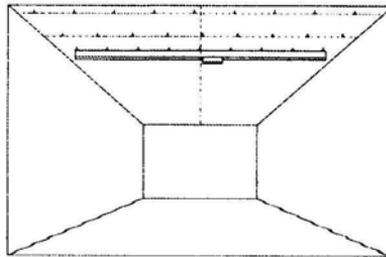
Establishing of the plaster coat face on the ceiling using a staff [2]
